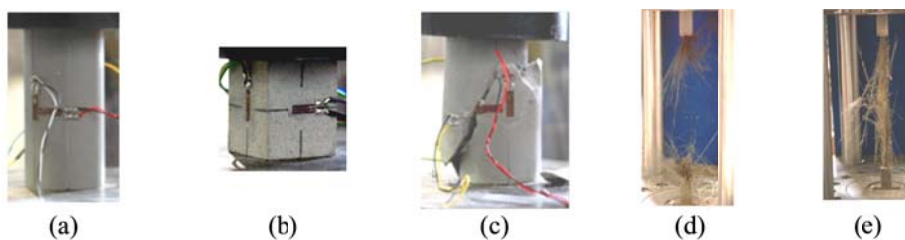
Material characterisation: structural adhesive specimens (a, b); typical failure of structural adhesive (c); typical failure of CFRP (d) and BFRP (e) bars
